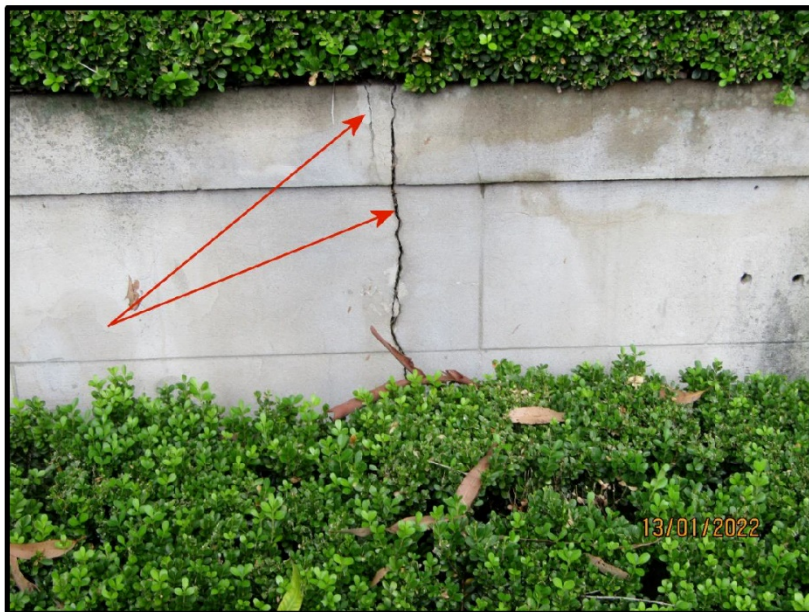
Showing the crack in the retaining wall with the crack larger nearer the top of the wall and a second crack developing near the top as the top of the wall starts to separate
